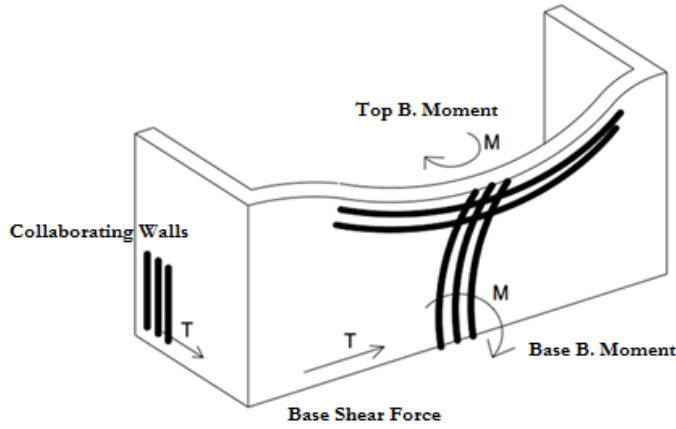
Assessment of the reinforced concrete bridge abutments.
